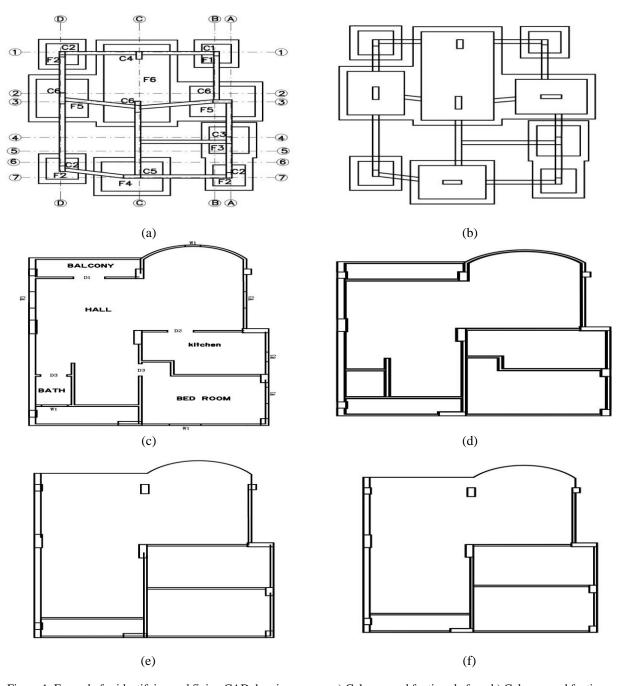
Example for identifying and fixing CAD drawings errors a) Columns and footings before; b) Columns and footings after; c) Architectural layout before; d) Architectural layout after; e) Structural layout before; f) Structural layout after
